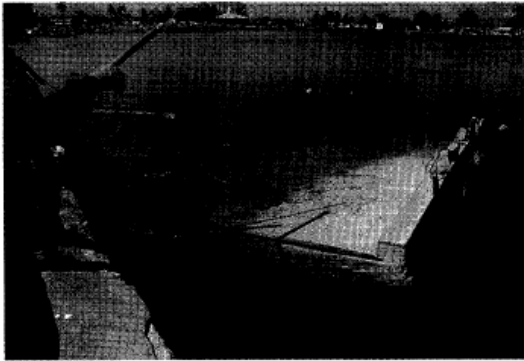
Collapsed floor slab of passenger jetty at a ferry port in Ujung Kalang, Meulaboh. (Tobita T., et al. (2006))
